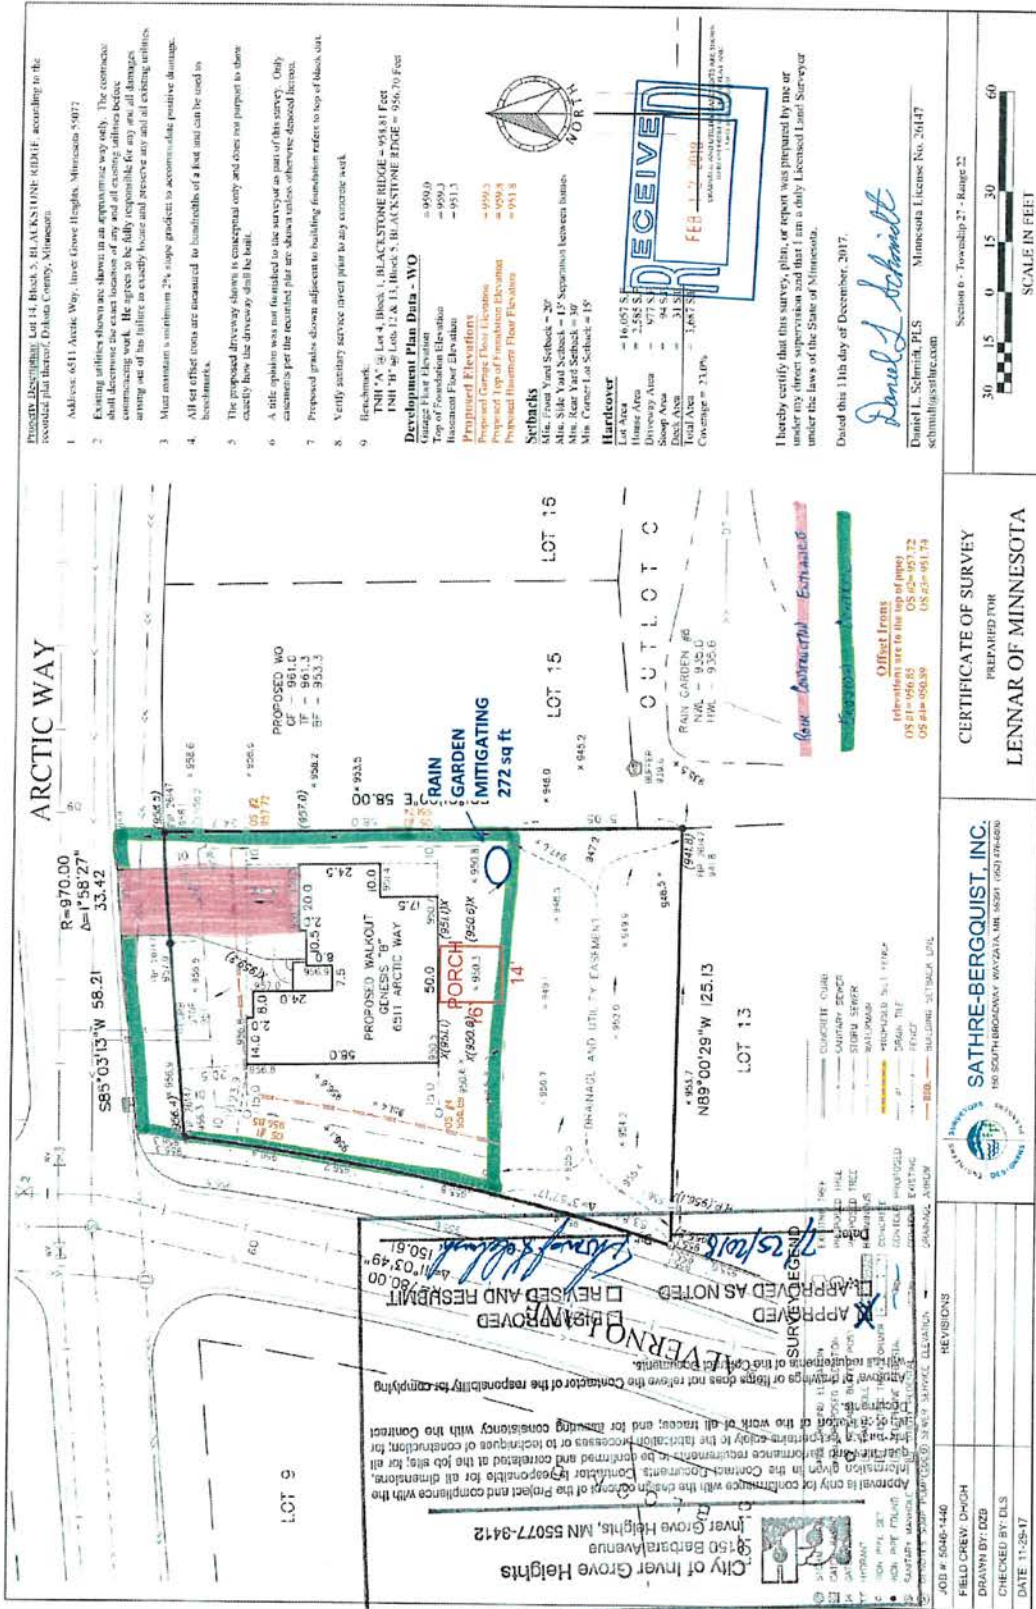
EXHIBIT A STORM WATER FACILITY PLAN (continued)
